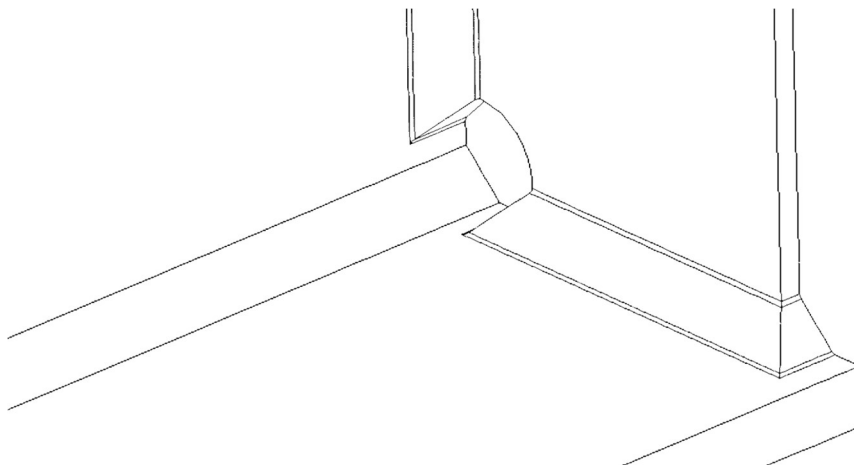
The geometry of the welds at the transverse stiffener.
